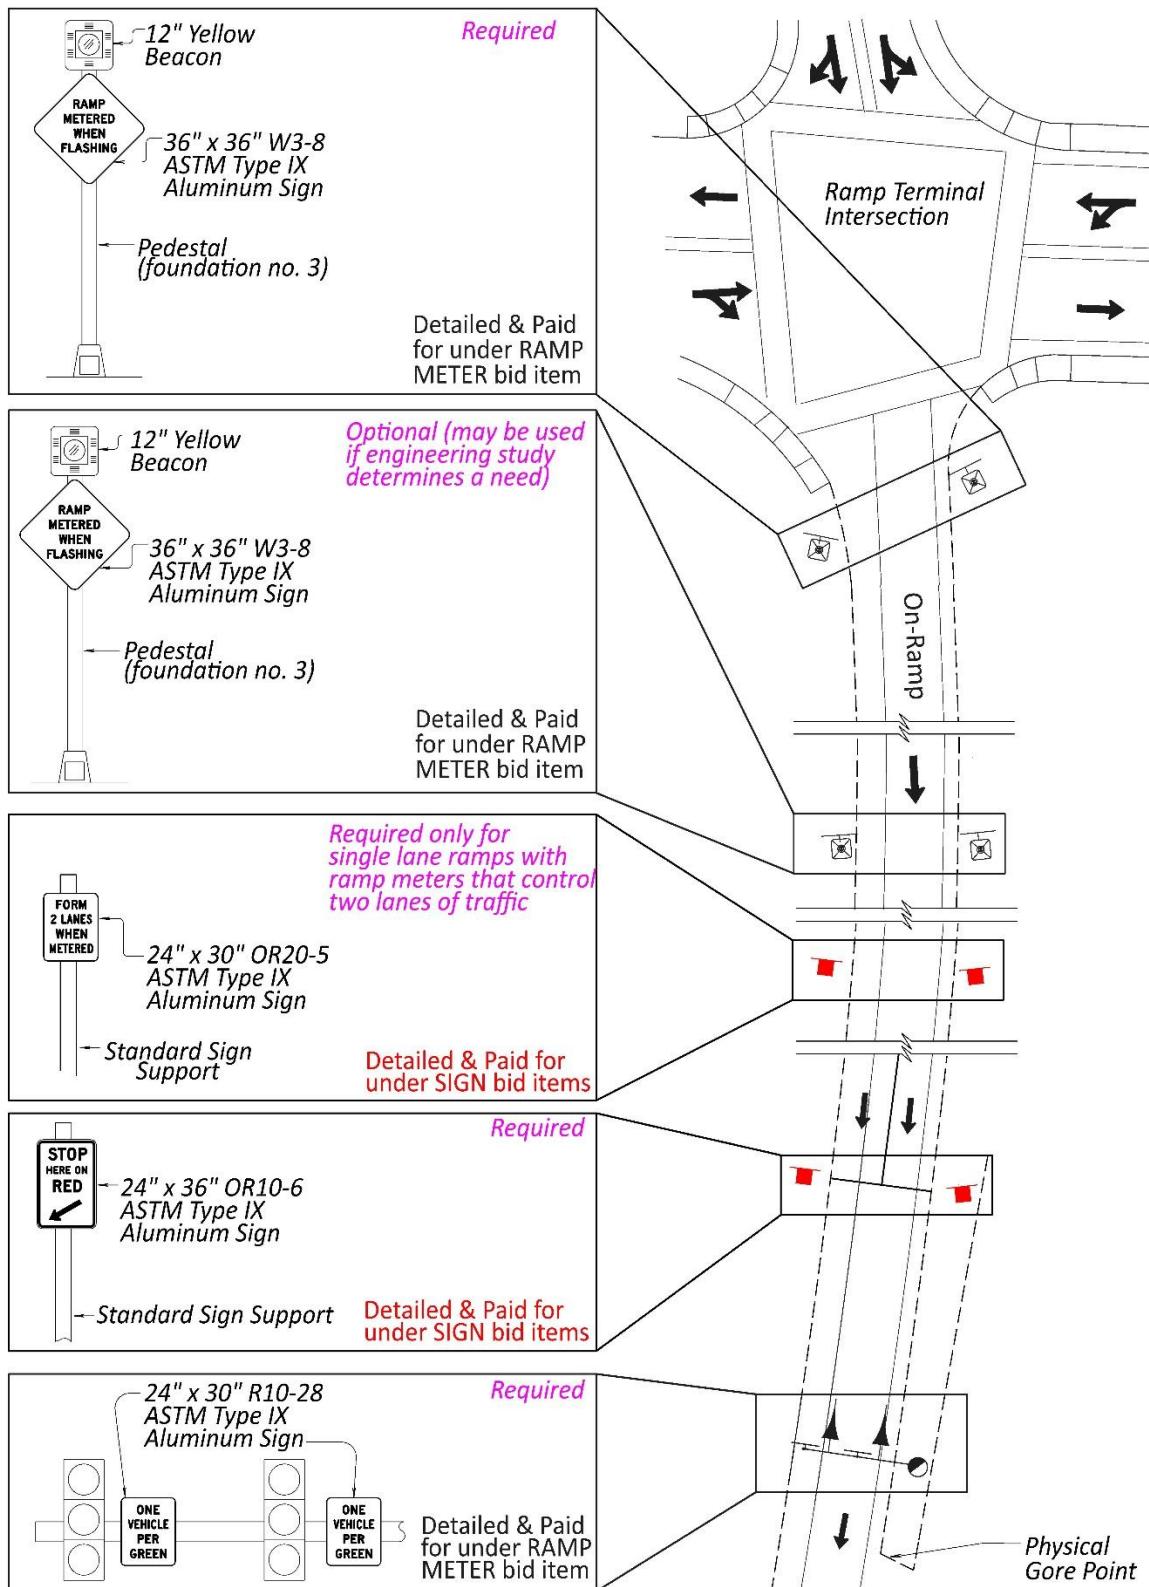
| Ramp Meter Sign Layout – Overhead Mounted Ramp Meter Assemblies
